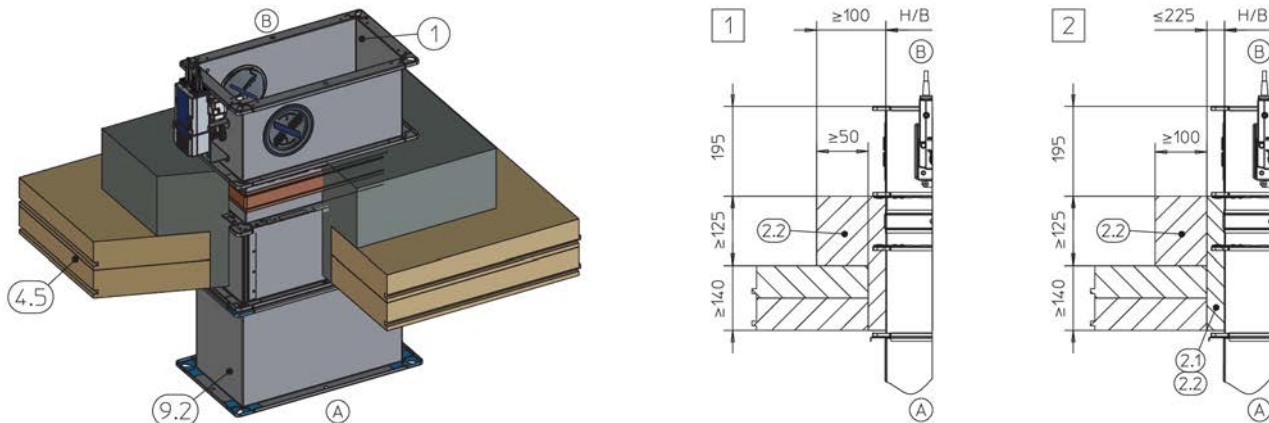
Mortar-based installation in solid ceiling slab in conjunction with wooden beam / laminated beam ceilings, upright (illustration as an example, can be used for other ceiling designs with wooden beams)
